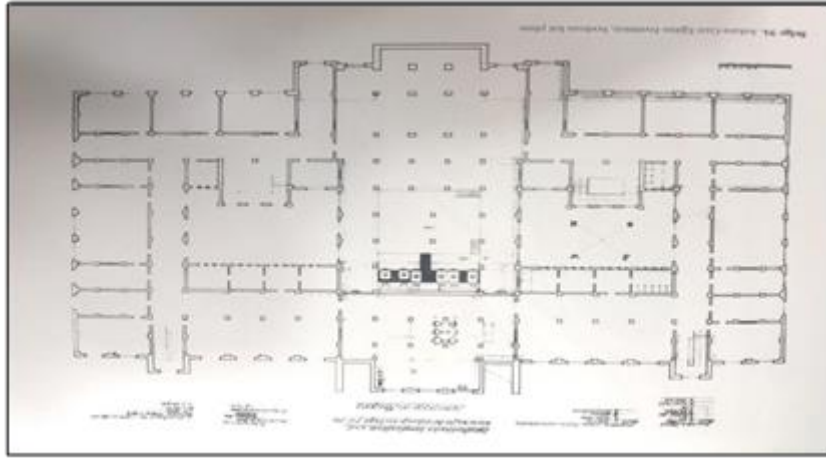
Gazi Education Institute, Basement Floor Plan, (Yavuz, Y, Empire to Republic Architect Kemalettin 1870-1927, Source: GEEA)
